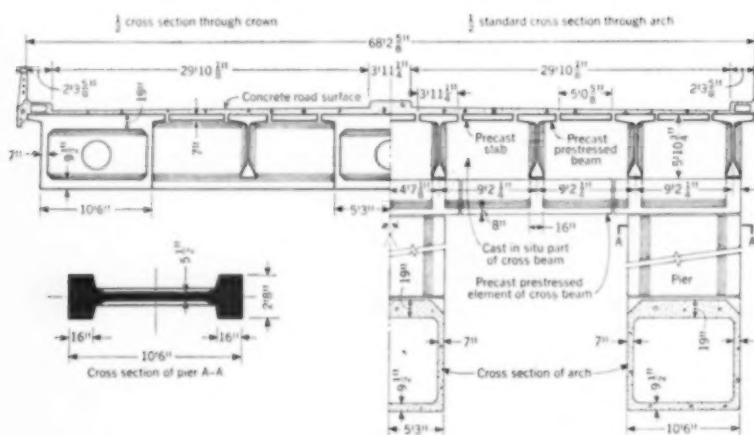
Three identical main-arch ribs support spandrel-column piers and same type deck as in approaches.
